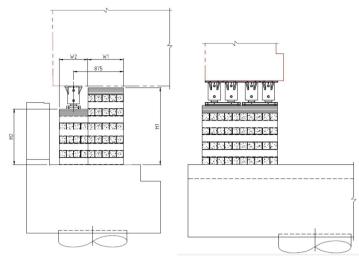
Elevation (left) and section (right) of the lowering system between the girder and abutment headstock.
